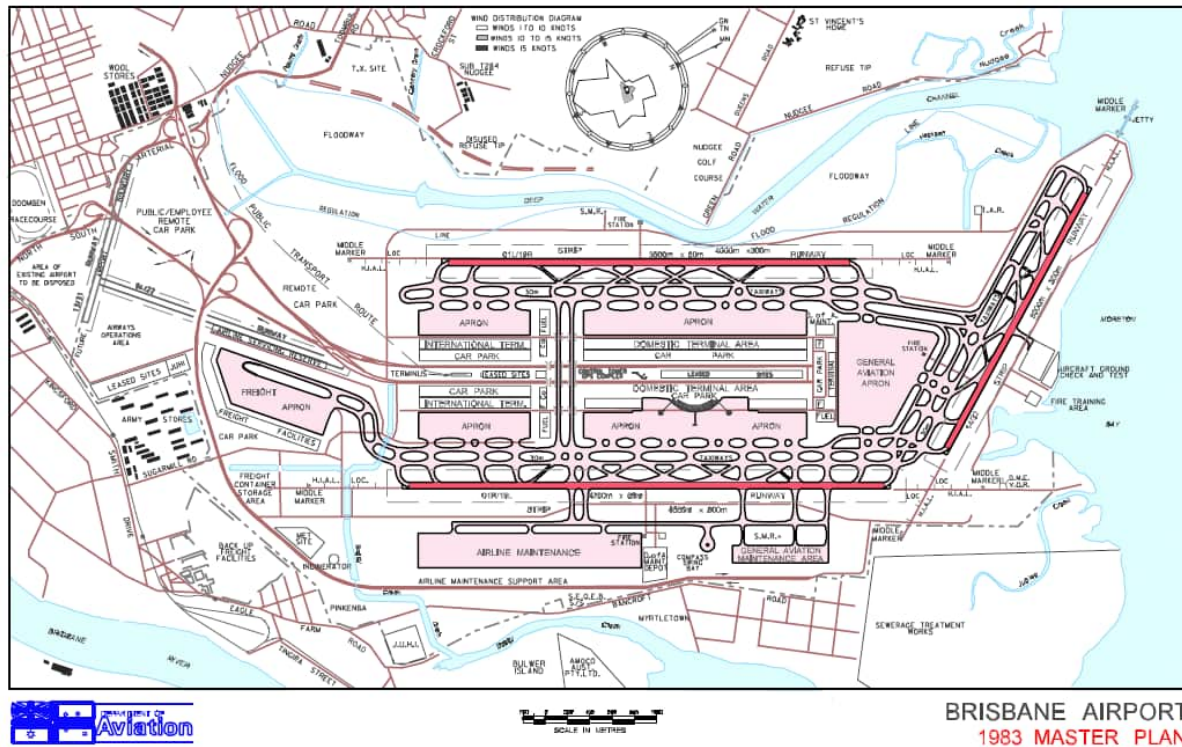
Original Airfield Layout from the 1983 Master Plan⁴³
